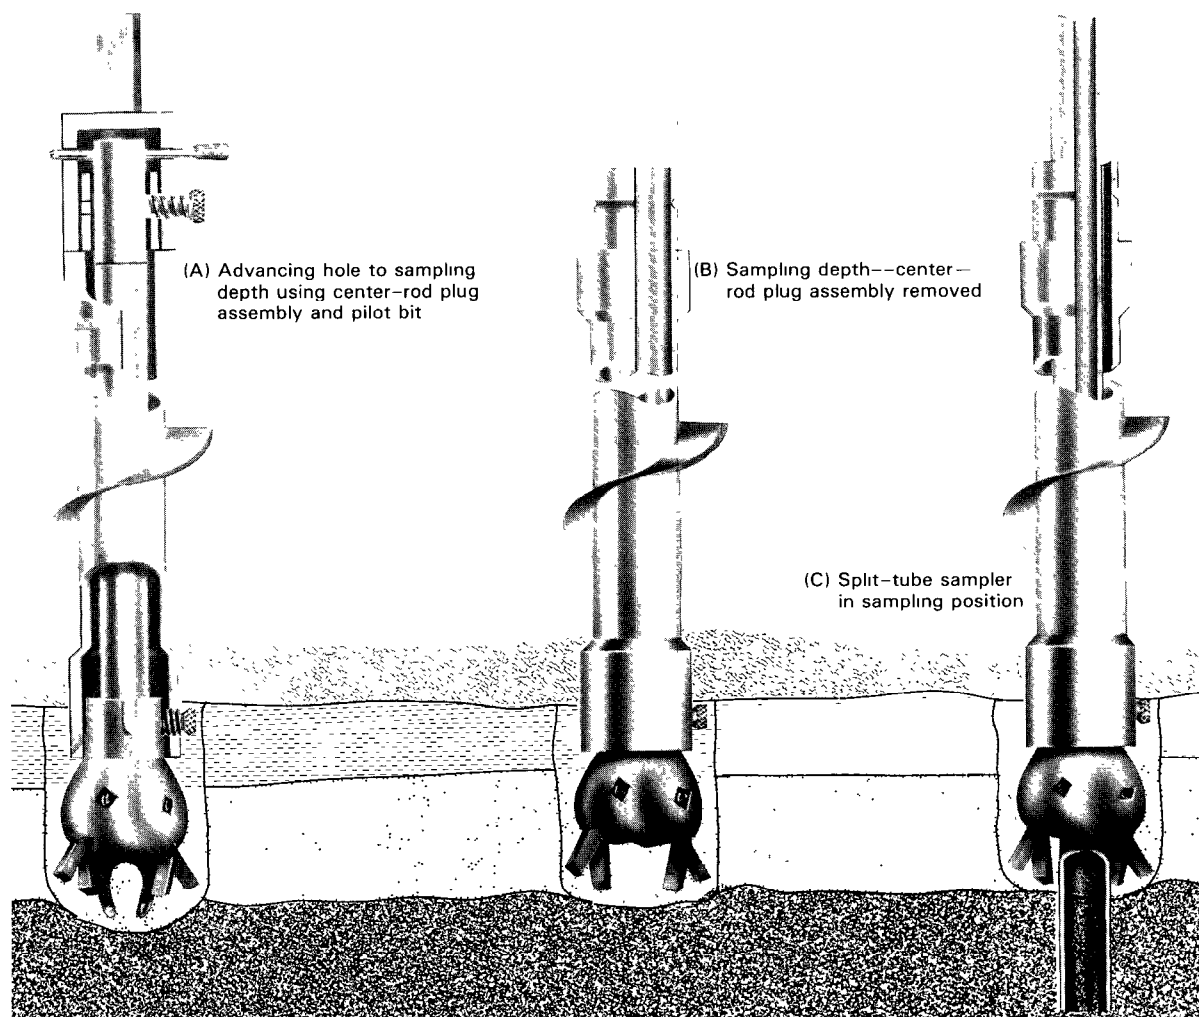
Soil-sampling technique using hollow-stem augers and split-tube drive sampler.
